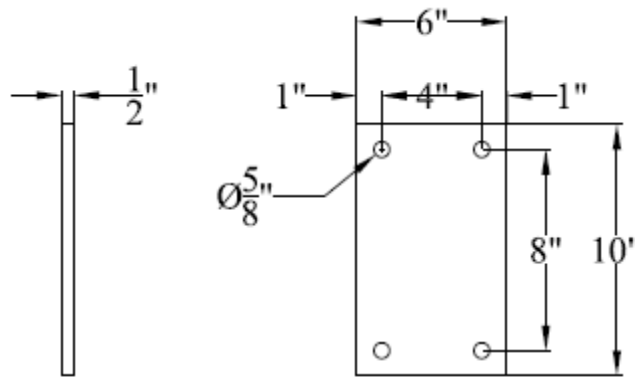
CAD Drawing of Shear Tab and Weld Size
